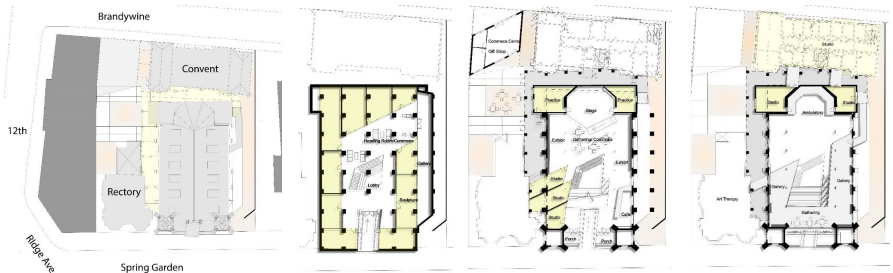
(From left to right) Site Plan, Basement, First Floor, and Gallery Level. Reference. Source: (Bourke 2019)
